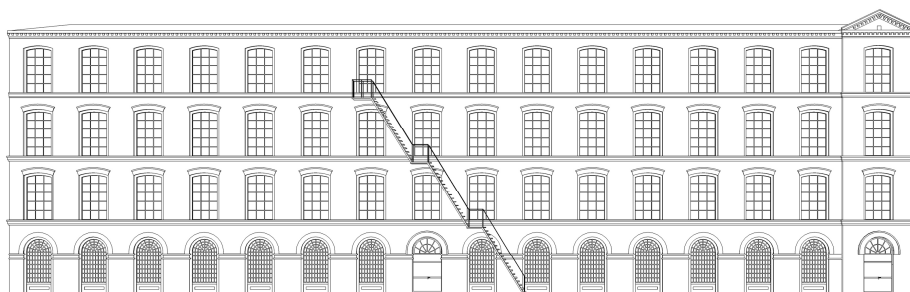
An example of a typical façade of a textile factory in Lodz. Author: A. Kurzac.
